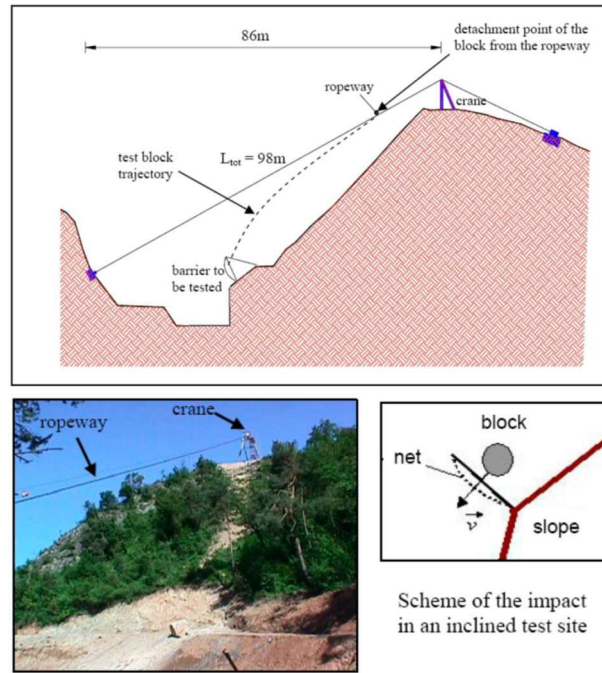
Scheme of the impact in an inclined test site (Peila & Ronco, 2009)
